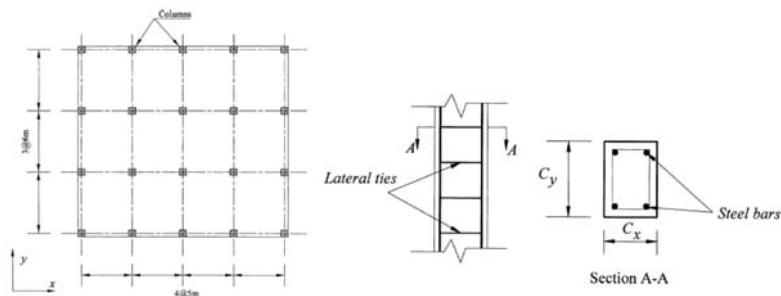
Typical plan of a three-storey reinforced concrete flat slab building.
